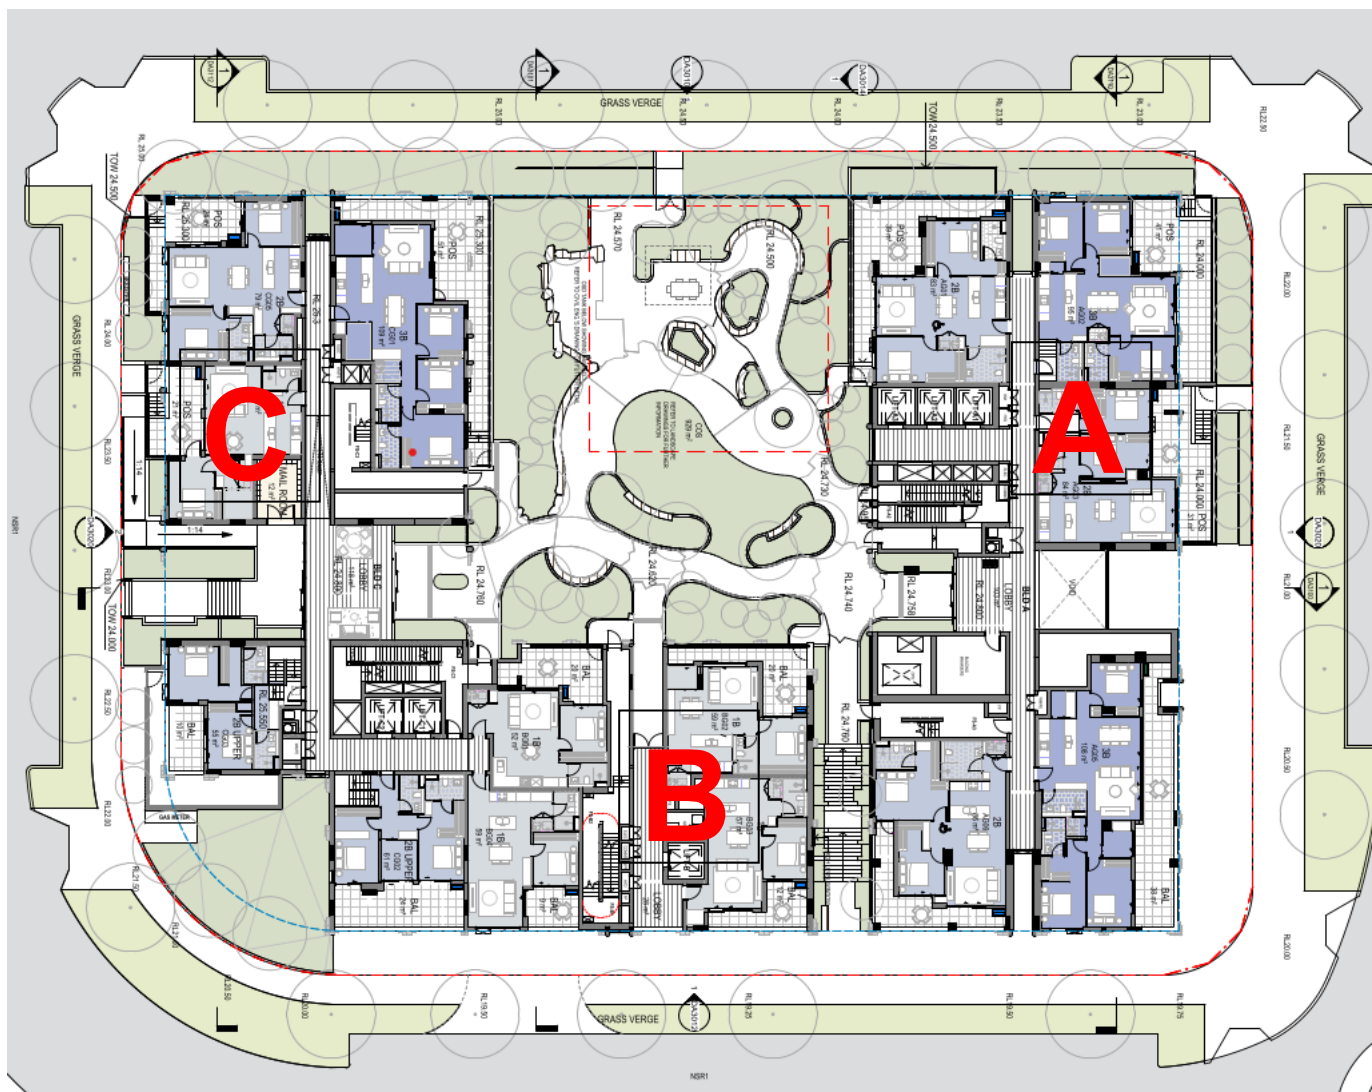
Ground floor plan of the development showing location of Buildings A, B and C
